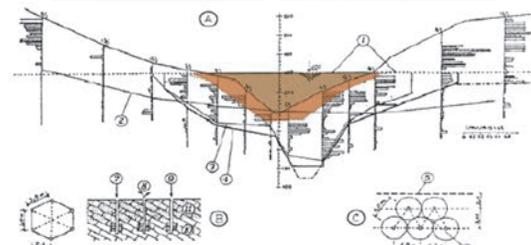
Grančrevo surface dam and underground dam (grout curtain) in its foundations
